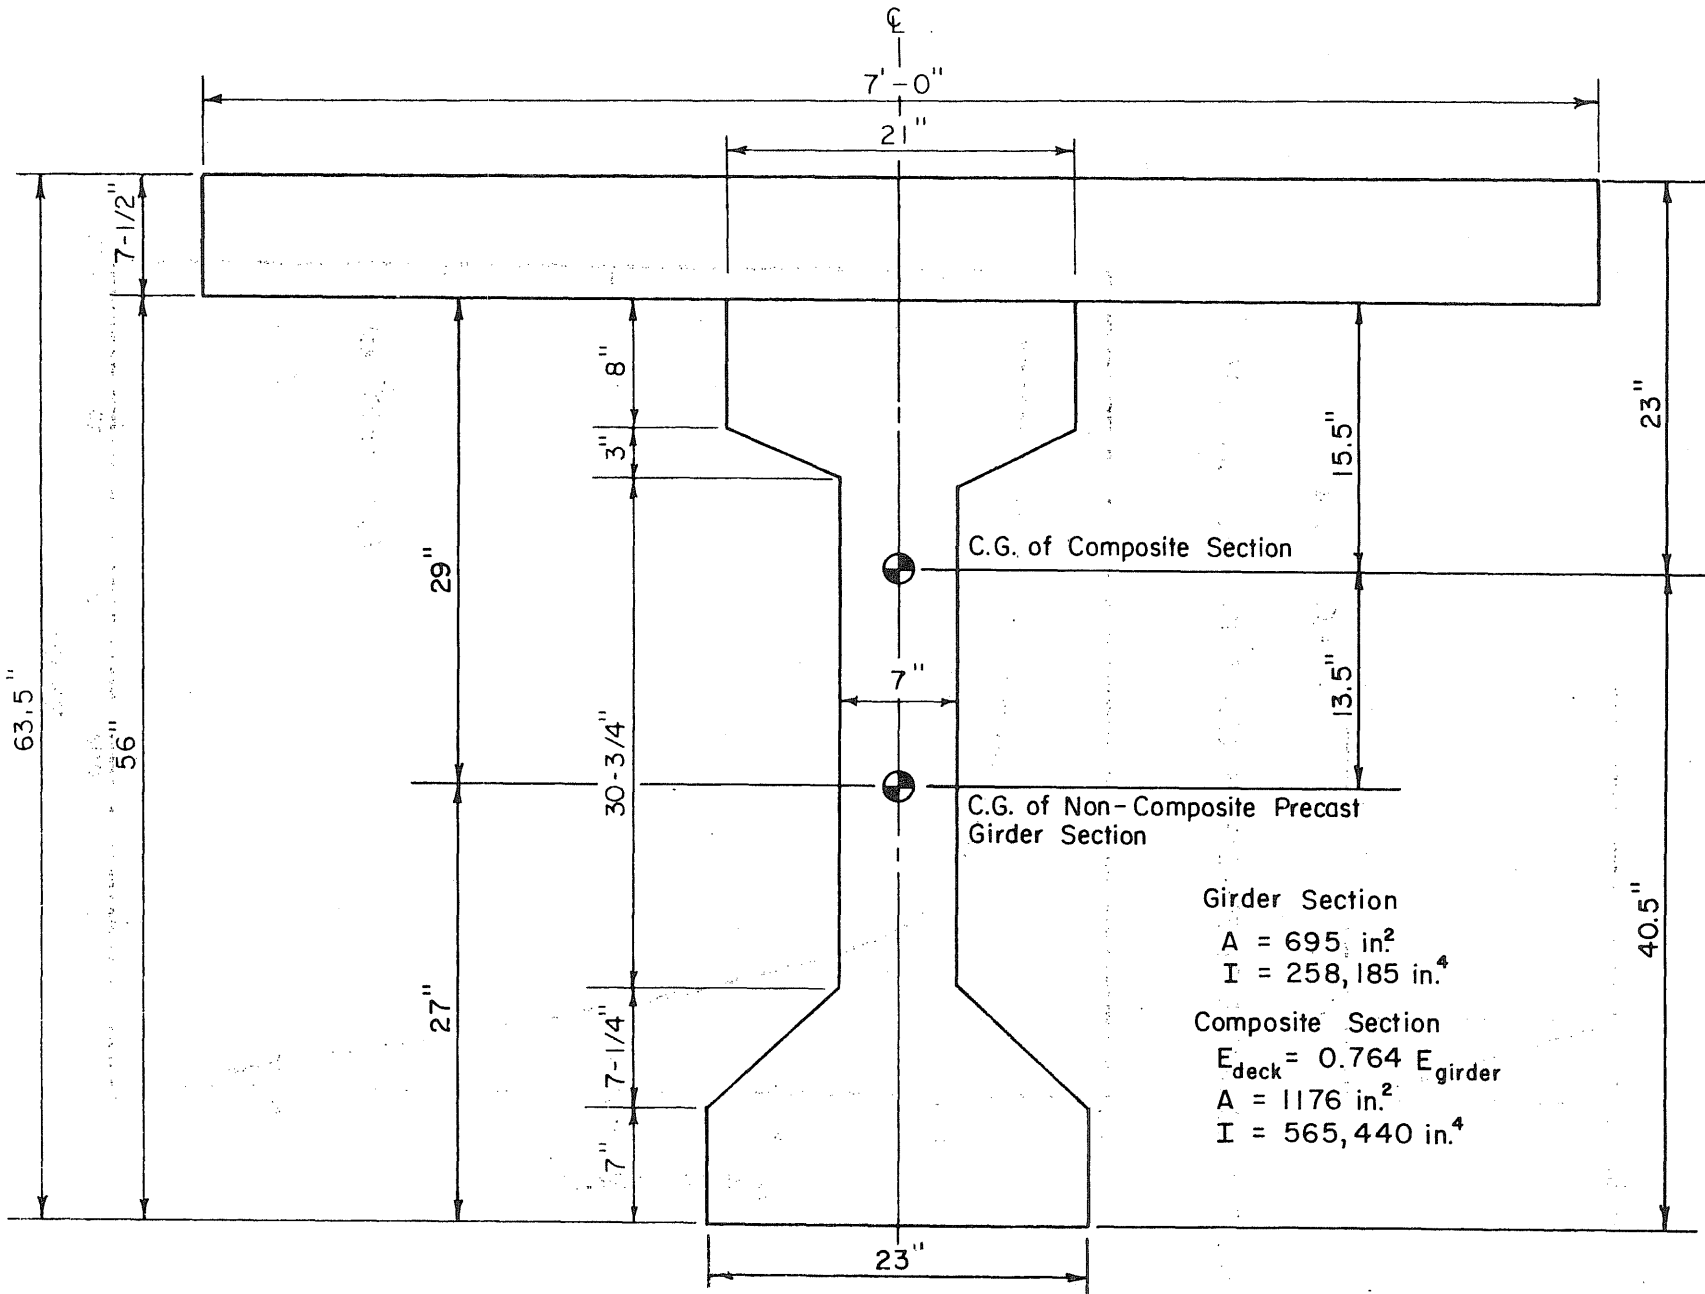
CROSS-SECTION OF GIRDER AND DECK
